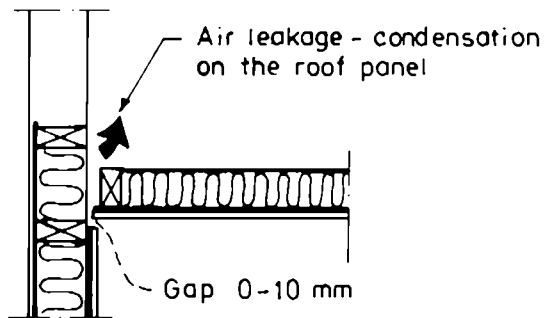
A common method of jointing between an outside wall and a truss in a dormer house. As a result of tolerances applied during building work, smaller gaps in the actual joint are not uncommon. Under certain conditions an internal overpressure sometimes occurs at the roof in upper floors of dormer houses. When there are gaps, air can leak through and cause moisture damage. It has been shown that gaps with a width of a few mm are sufficient to cause damage.
